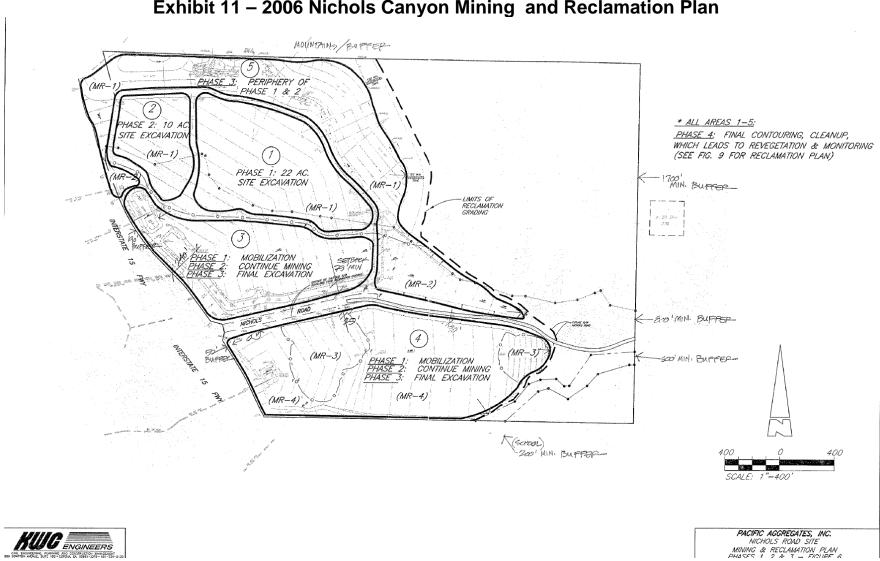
2006 Nichols Canyon Mining and Reclamation Plan
